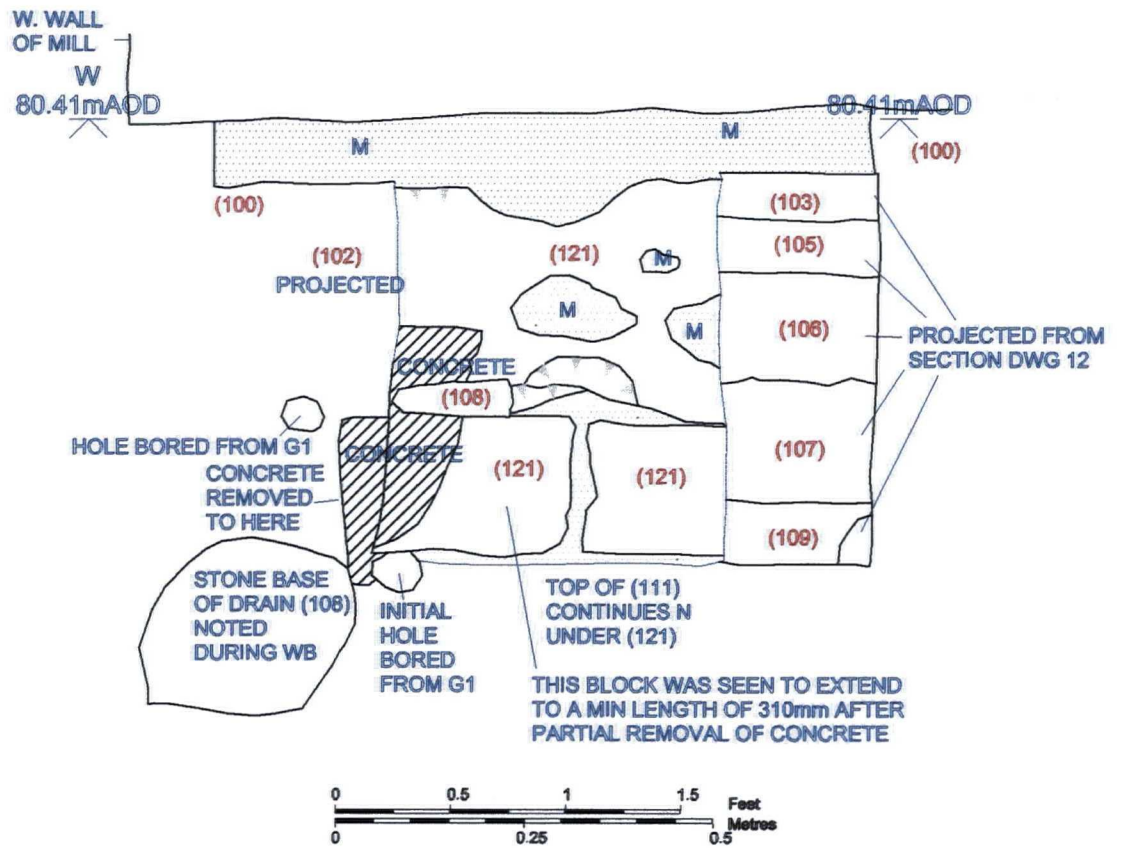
South facing elevation of wall (121). (Scale 1:10).
